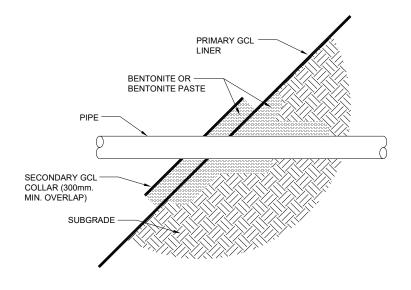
Typical pipe penetration section detail (after ASTM D 6102) (Note: change min overlap to 500mm)
